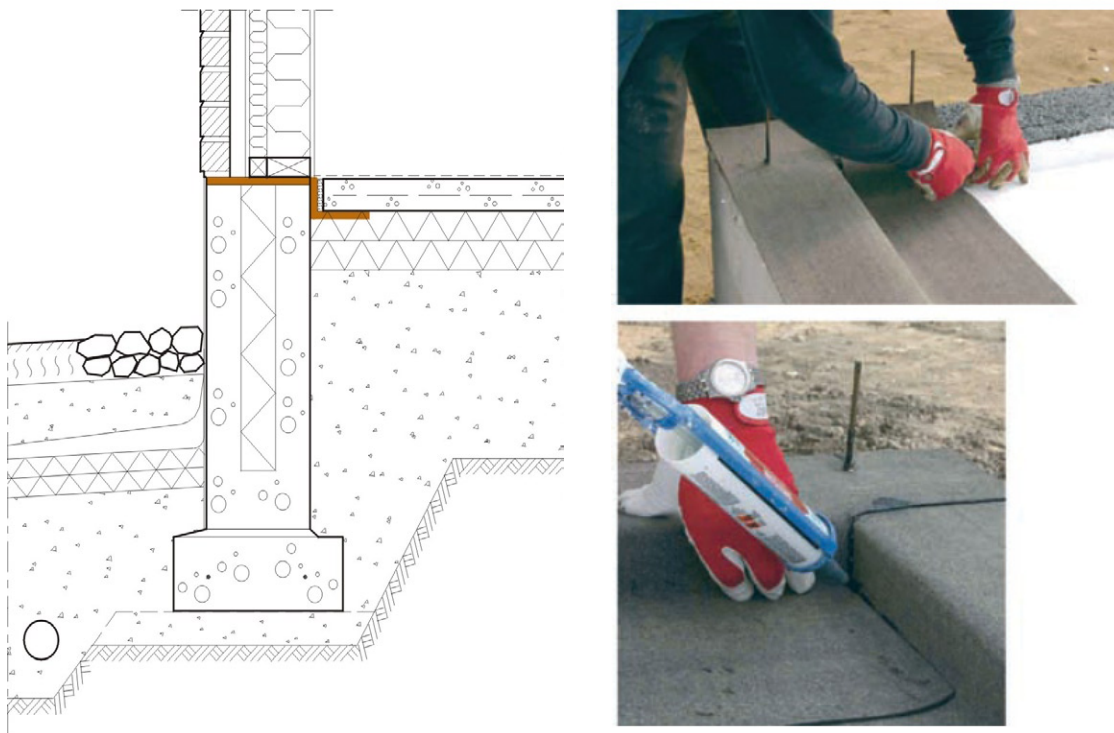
Sealing of the gap between foundation wall and floor slab in the Finnish guide (Building Information Ltd 2003, Katepal Inc).
